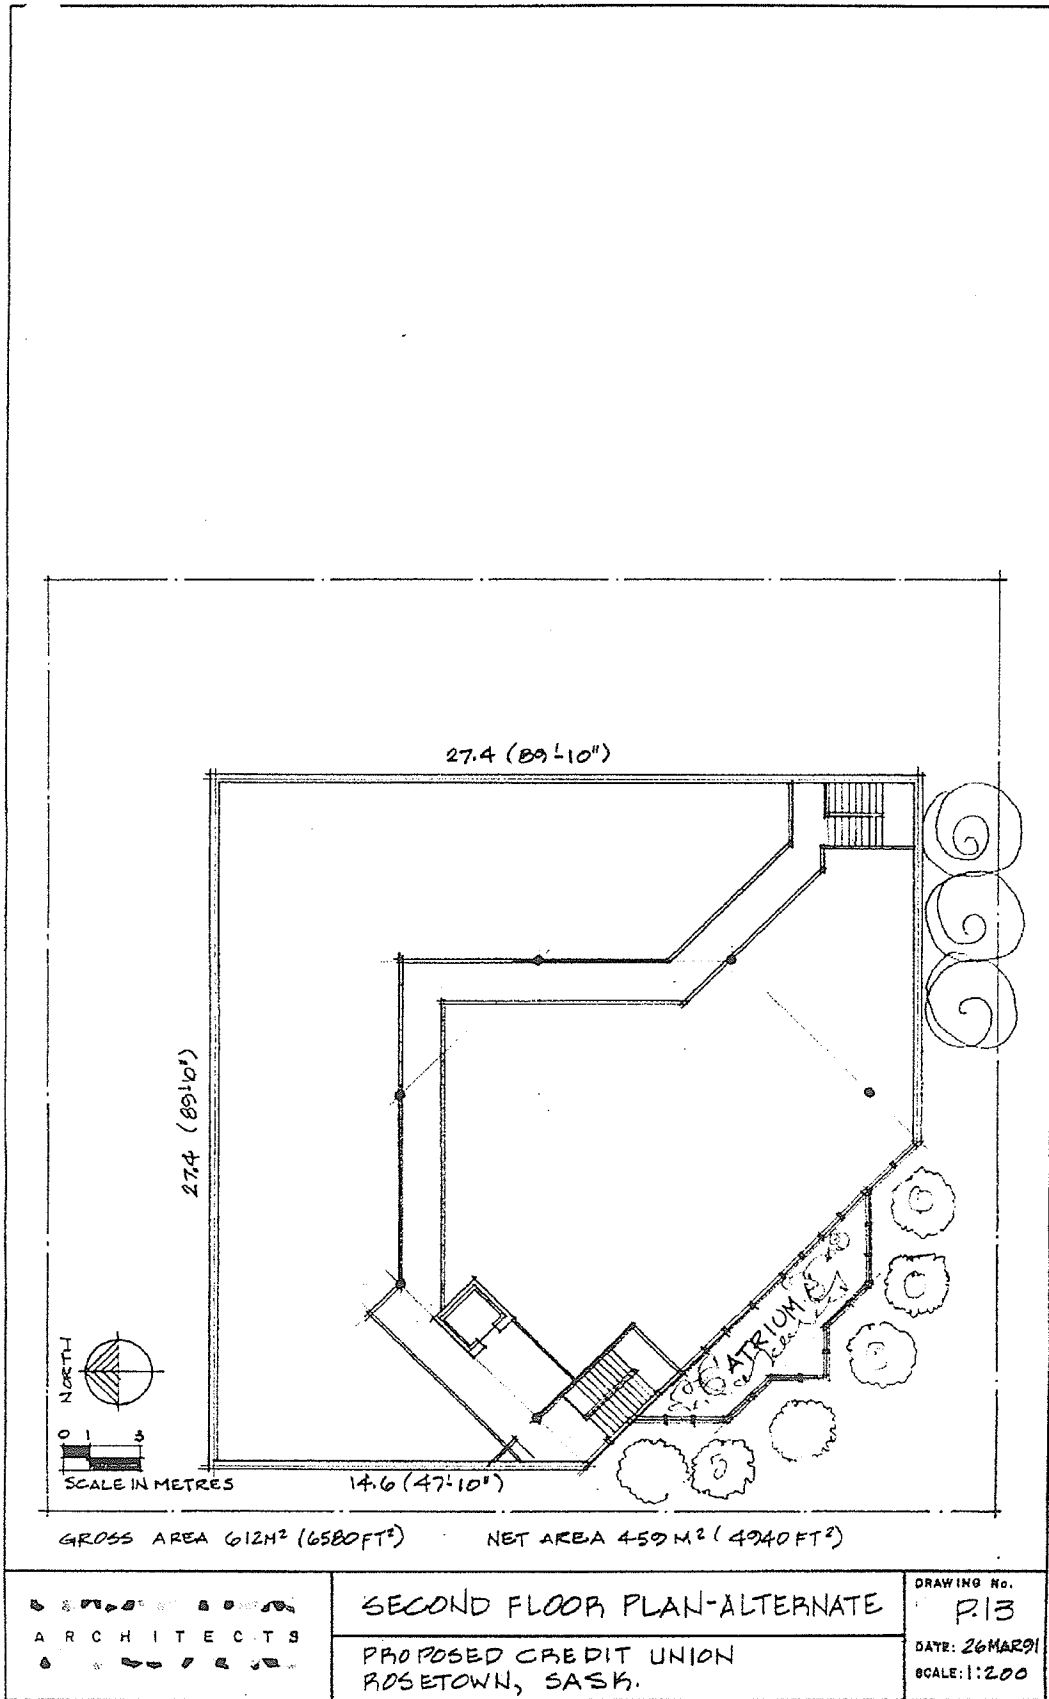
Architect design sketch 13, Second Floor Plan Alternate. Courtesy of the architect.
